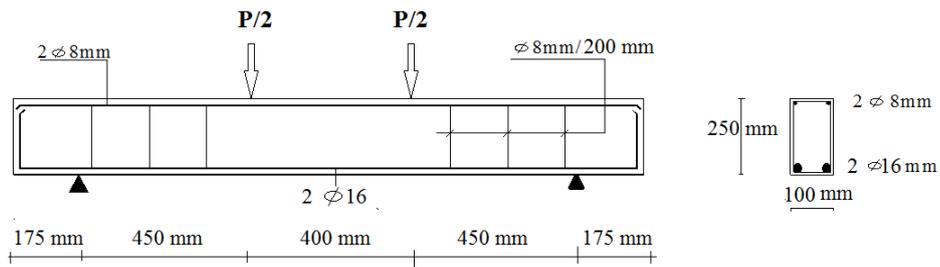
The Beam Dimensions and Reinforcement Details of the Beam Specimens
